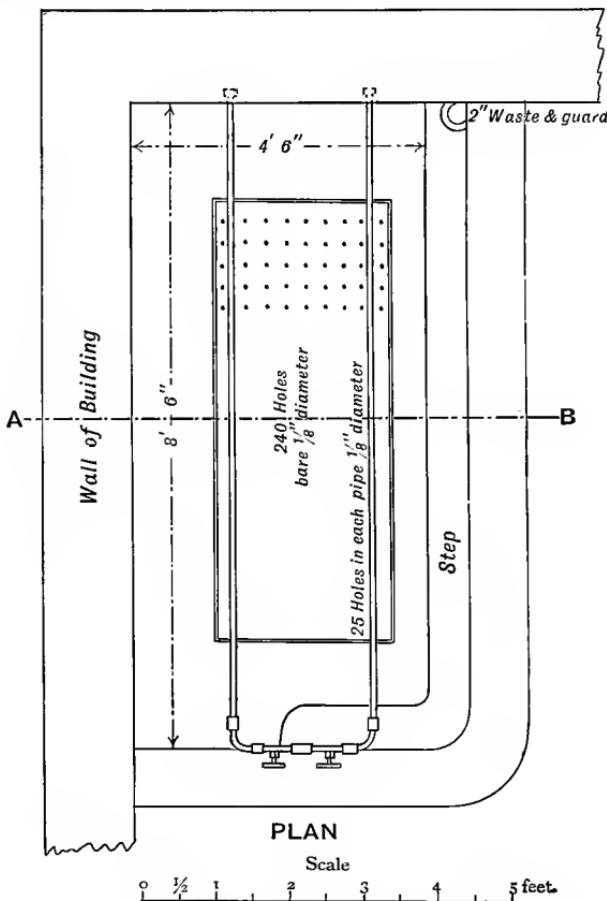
Plan showing construction of the “Sprinkle Baths” at the Leavesden Schools.
